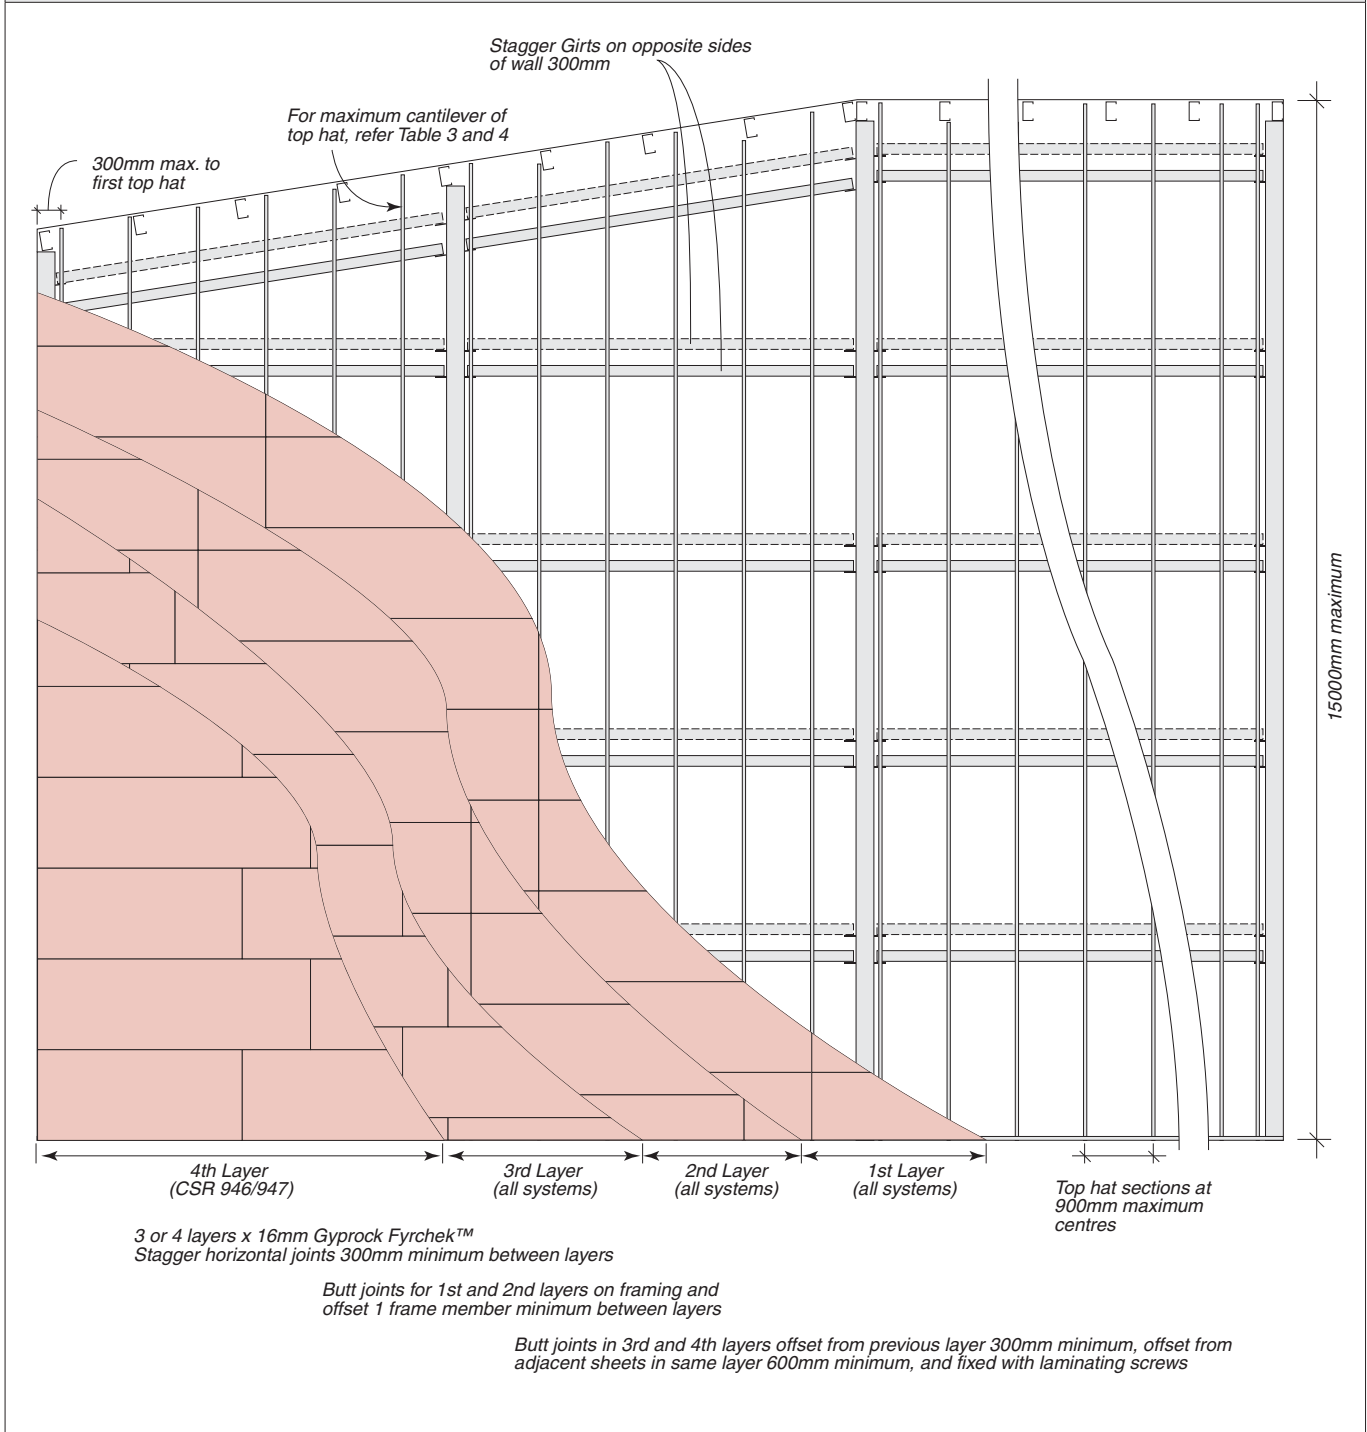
TYPICAL WALL CROSS SECTION – ELEVATION
